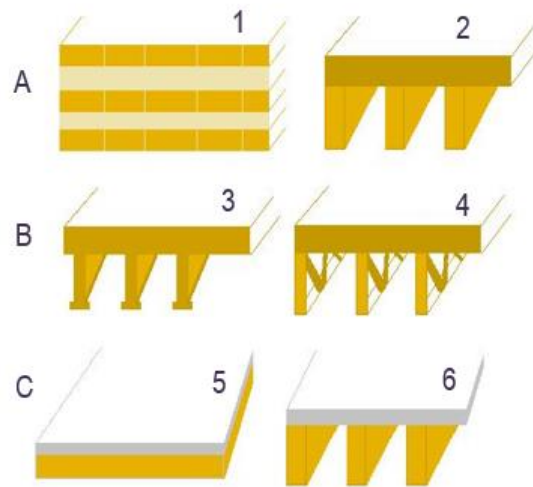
Schematic representation of ceiling-to-floor structural systems in timber buildings: (A) Heavy timber ceiling to-floor structural systems; 1 Massive timber floors (CLT); 2 Timber slab with BLC beam ; (B) Lightweight frame ceiling-to-floor structural systems; 3 Parallel I-joists with timber subfloor; 4 Parallel perforated joists with timber subfloor; (C) Ceiling-to-floor hybrid systems: Timber-concrete assemblies; 5 CLT floor with concrete slab; 6 Timber structure of glulam beams with a layer of concrete added on it. [adapted from figure 1. of [62]].
